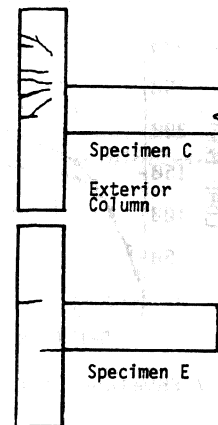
Flexural Cracks in Exterior Columns
